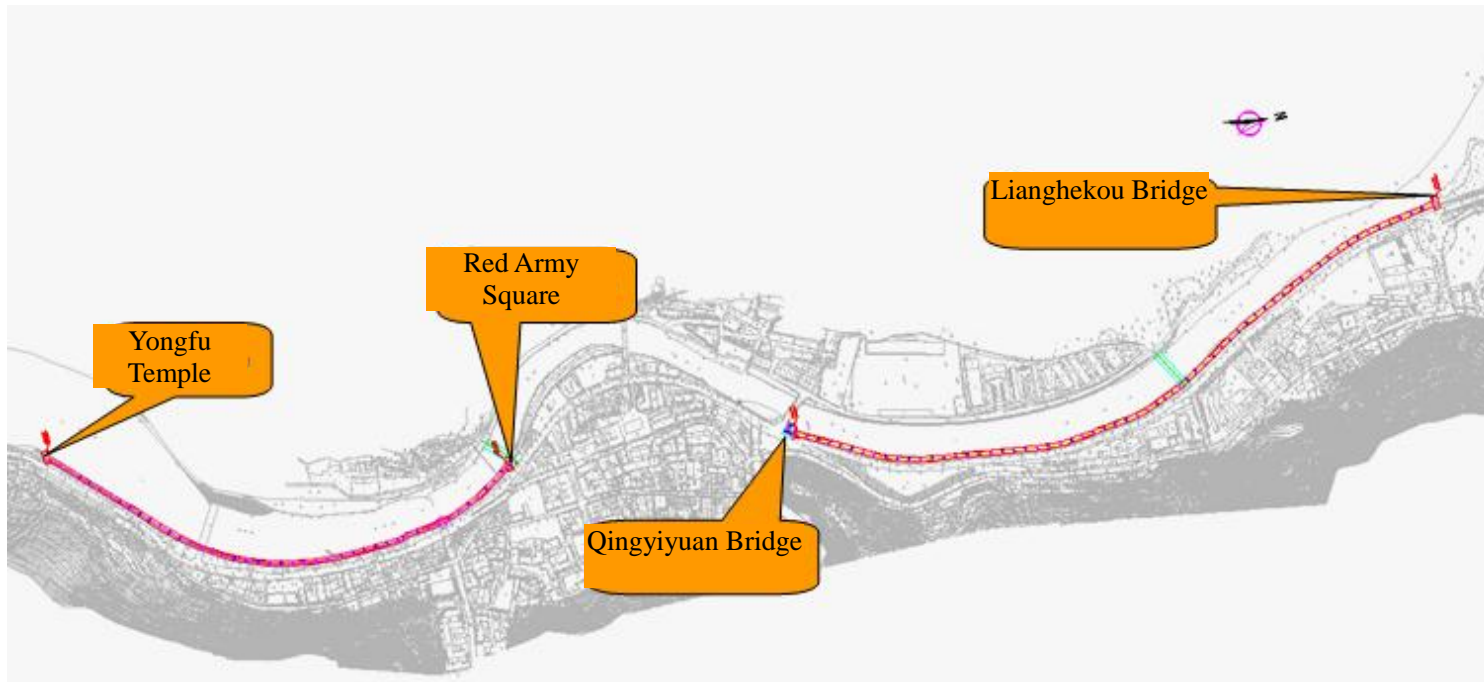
General layout of emergency refuge passage along Yanjiang Road in Baoxing County
